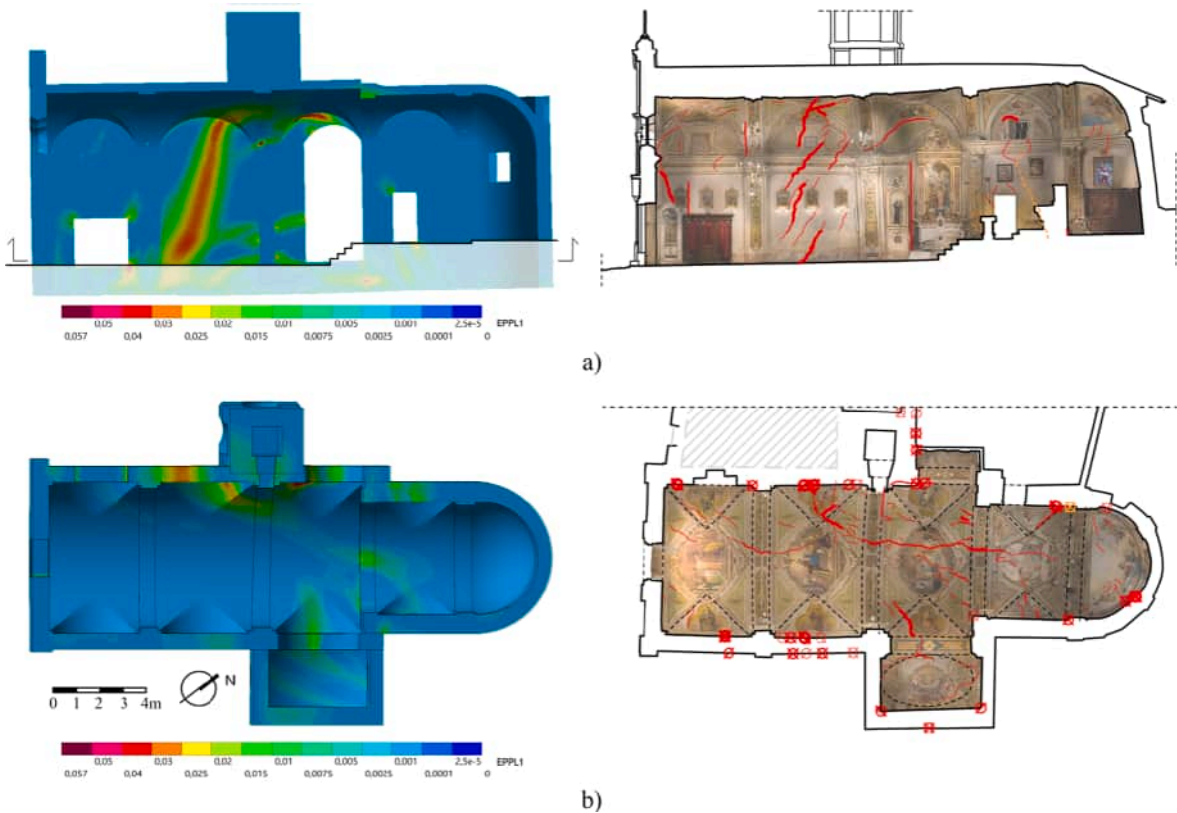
Comparison between FE results (in terms of maximum principal plastic strain, on the left) and crack pattern surveyed on site (on the right): a) section AA' (left longitudinal wall), b) plan (vaults and walls).
